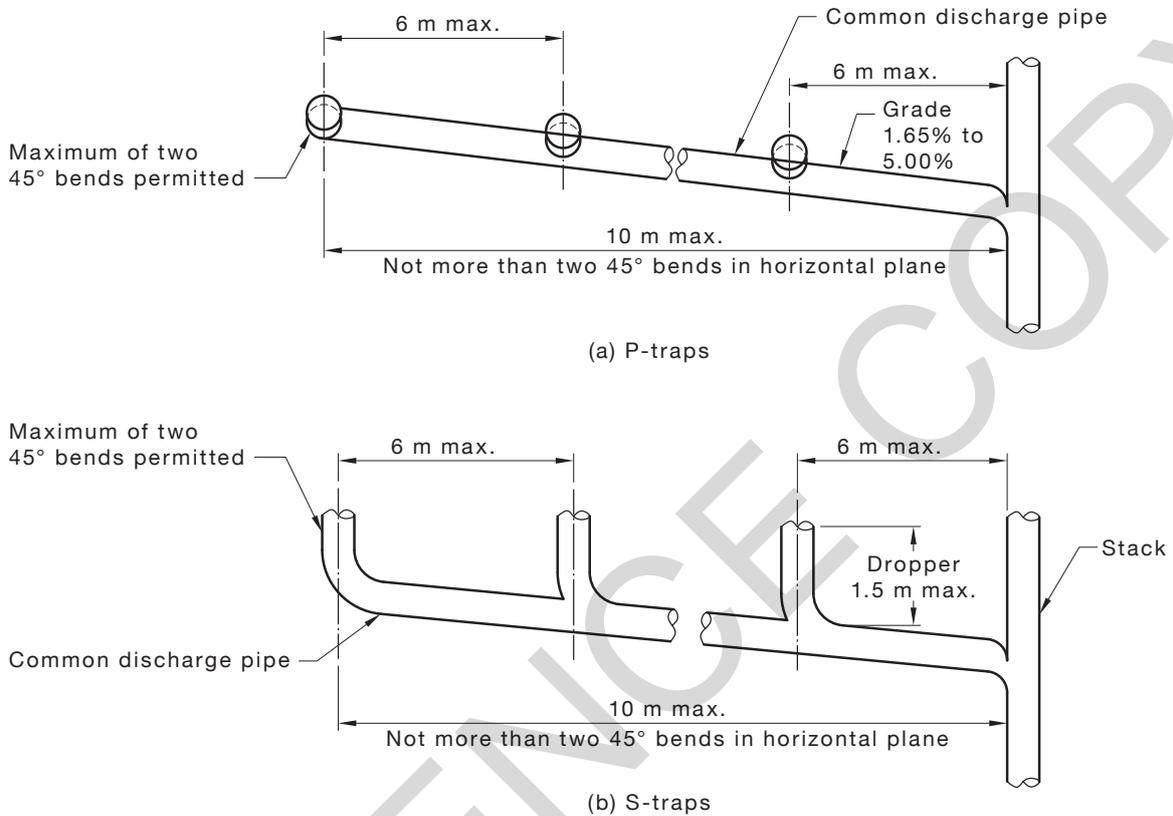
CONNECTION OF WATER CLOSET PANS
